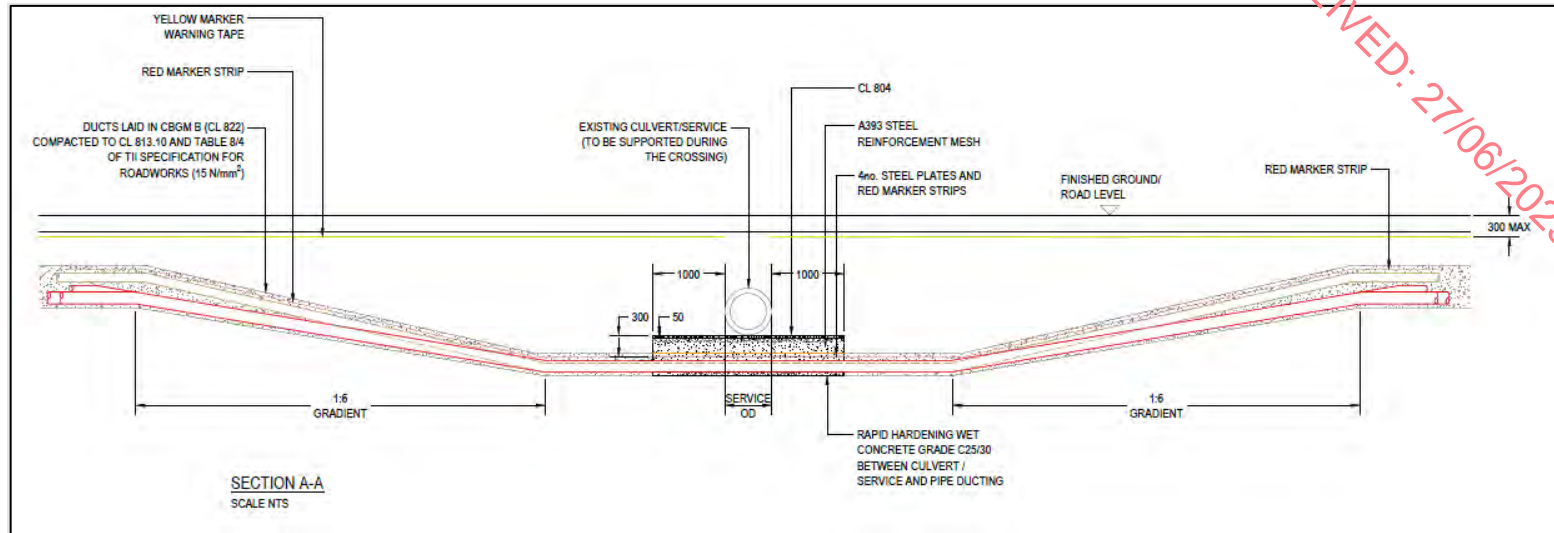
Typical Cable Service Pipe Undercrossing Detail
